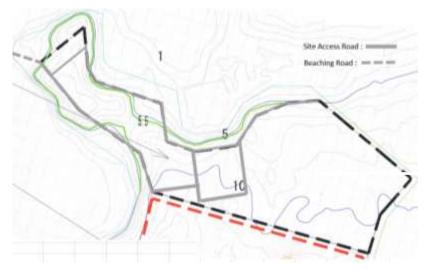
Draft Plan of Administrative Road Source: JICA Study Team, 2018
